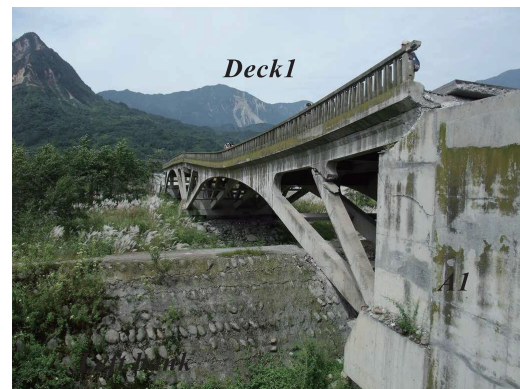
shows the damage of Xiaoyudong Bridge, and Photo 8 shows damage of slant-leg at Deck1. By numbering abutments, piers, and decks from the left bank, decks 1, 3 and 4 collapsed. And Deck3 and 4 was fallen. At right abutment A2, pavement permanently displaced about 0.2 m in the backsoil side due to the collision of deck 4 and A2. Extensive shear cracks were developed in the side walls resulting from
